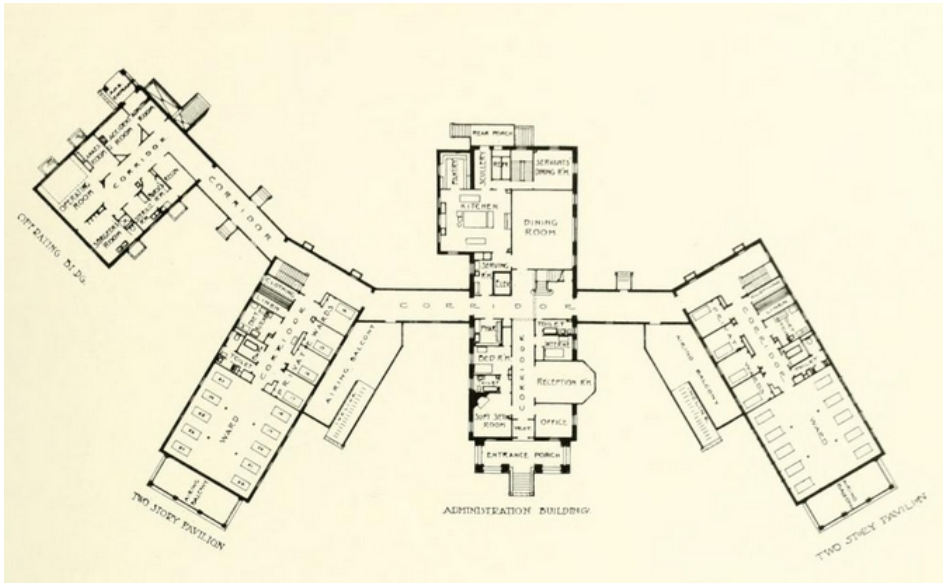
First floor plan. Left to right: Operating Building (not extant), West Pavillion, Administration Building, East Pavillion with connecting corridors. Airing balconies adjacent to corridors on West and East Pavillions. (Source: Stevens, 1912.)
